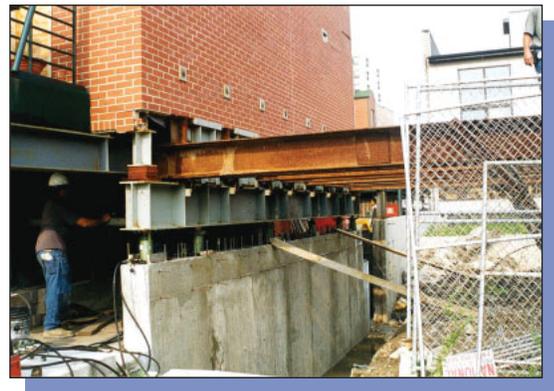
Hydraulic jacking of structure from newly-placed concrete foundation.
